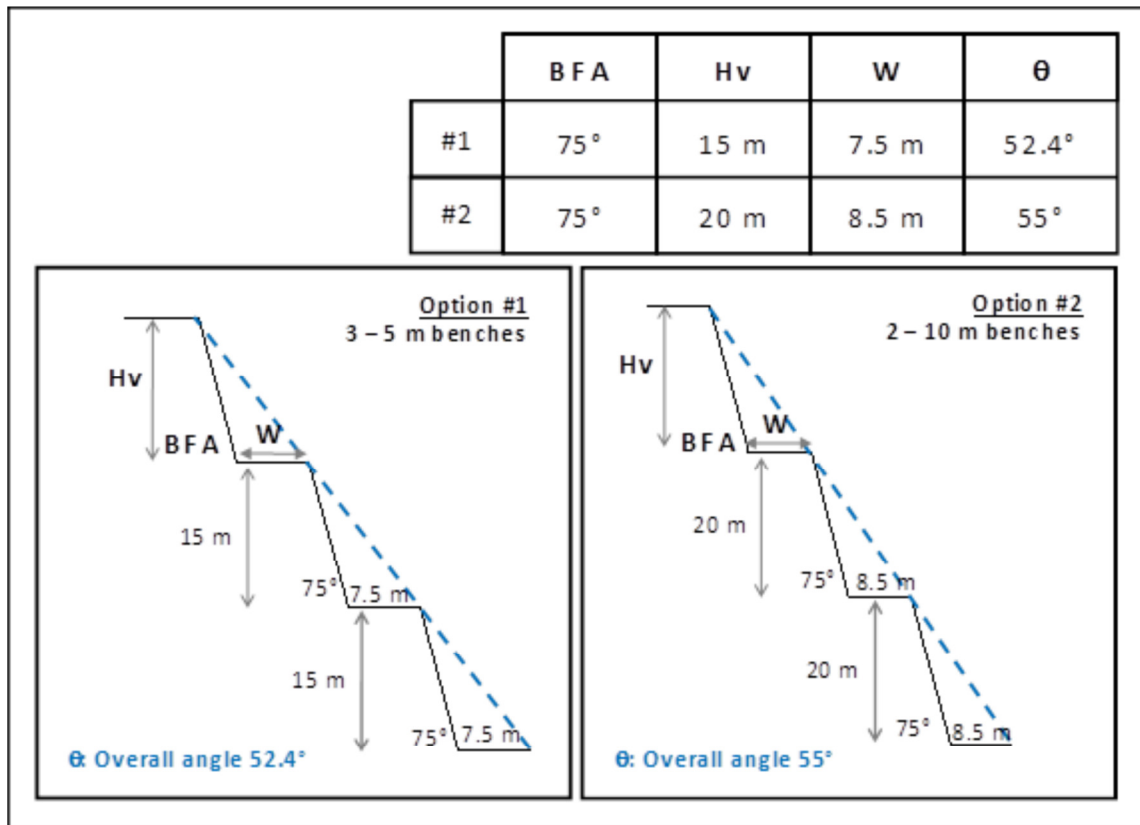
Recommended slope configurations for the Duparquet Project
